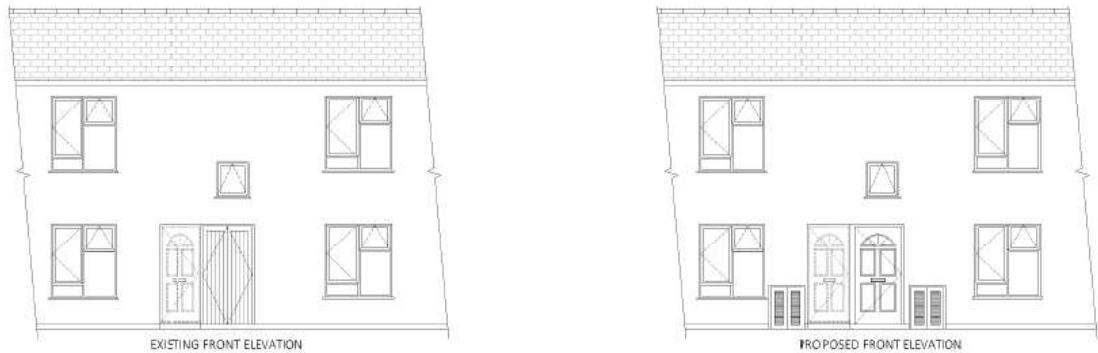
Proposed Elevations (please note – larger version of plan can be found in the Committee Plan Pack)
